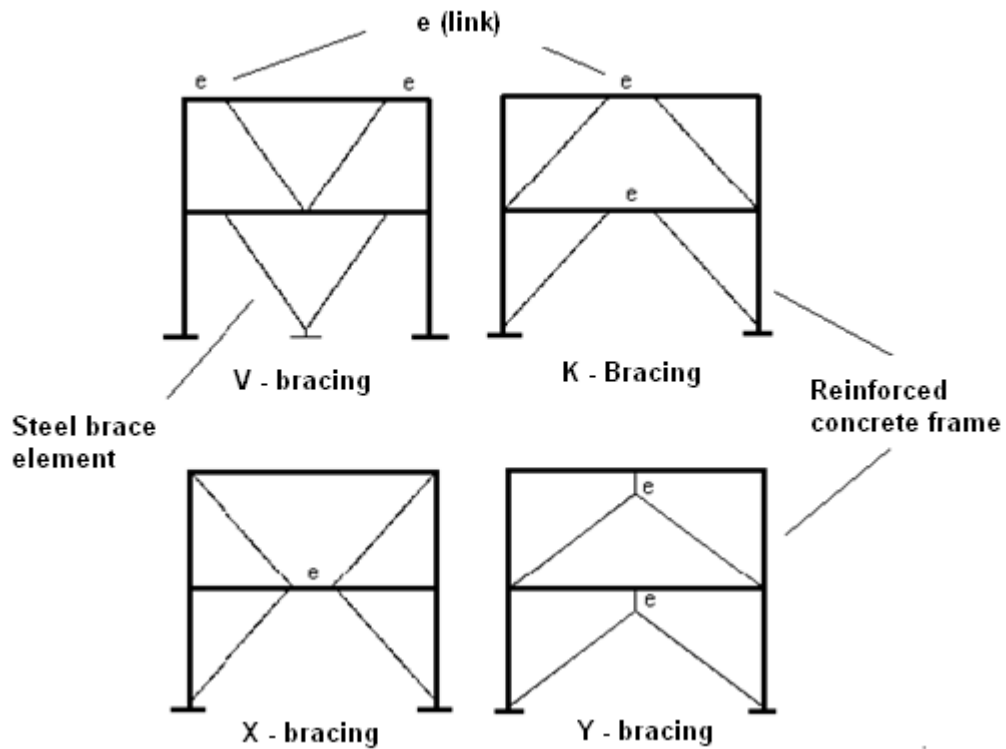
Eccentric bracing systems for retrofitting RC structures
